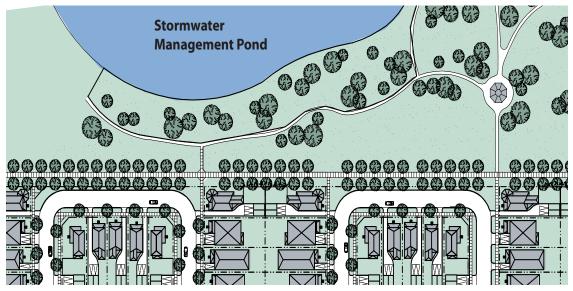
Not more than 50% of a stormwater management pond should be bounded by the rear or side yards of adjacent buildings.
